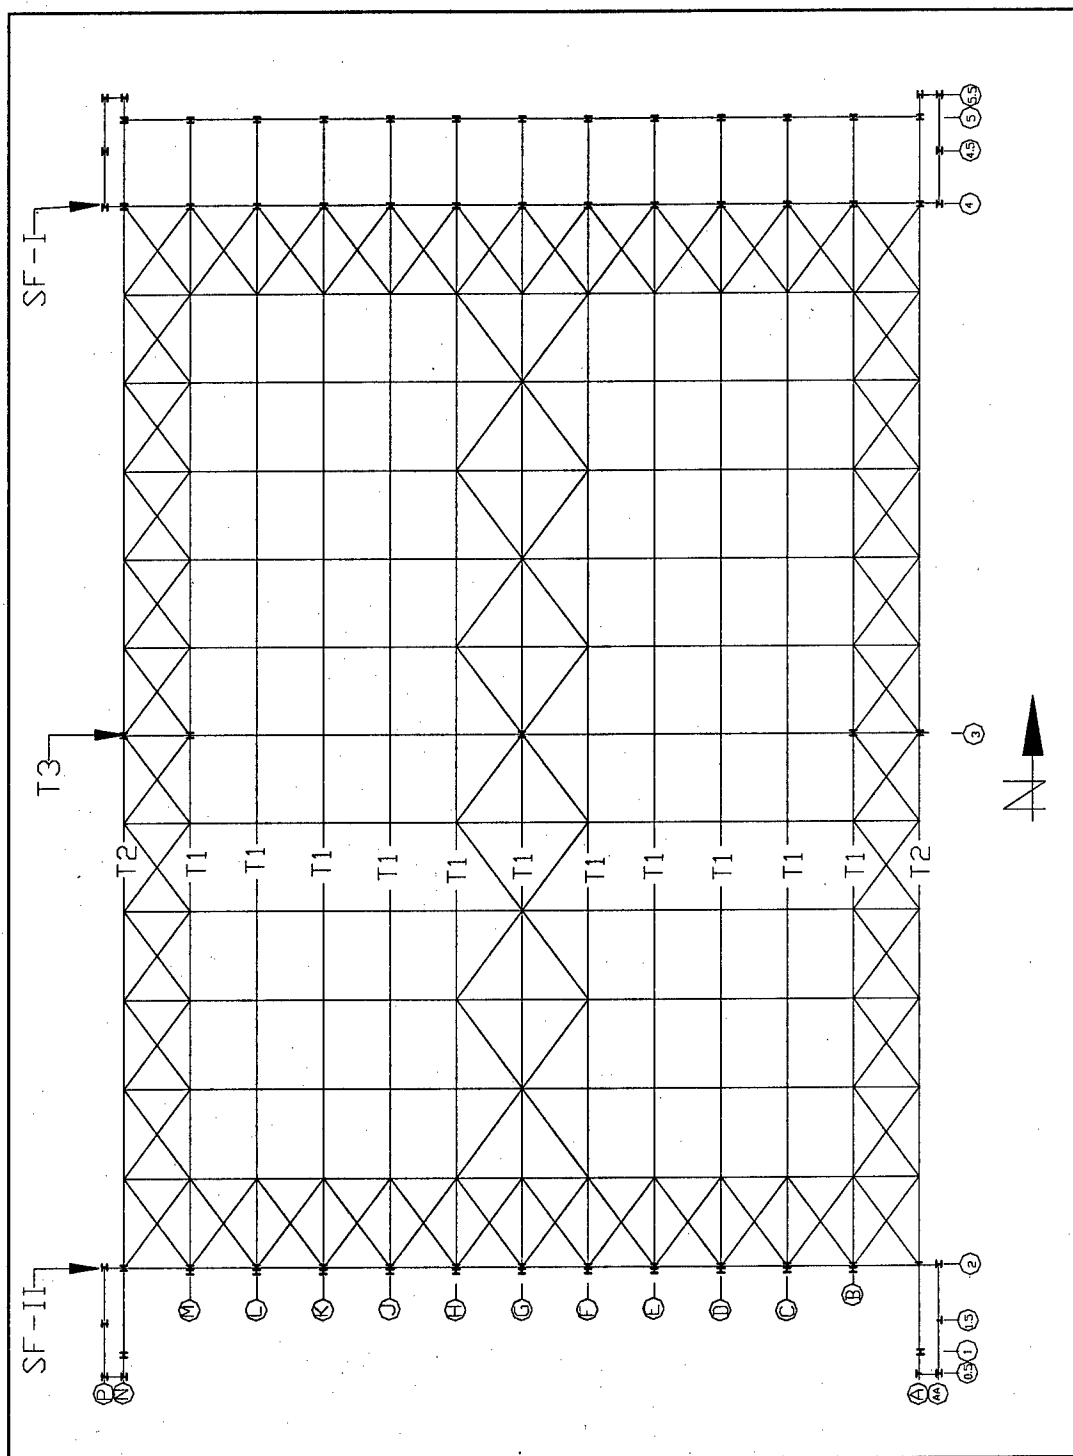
CCAD, TX, truss types in Hangars 44 and 45 (plan view).
